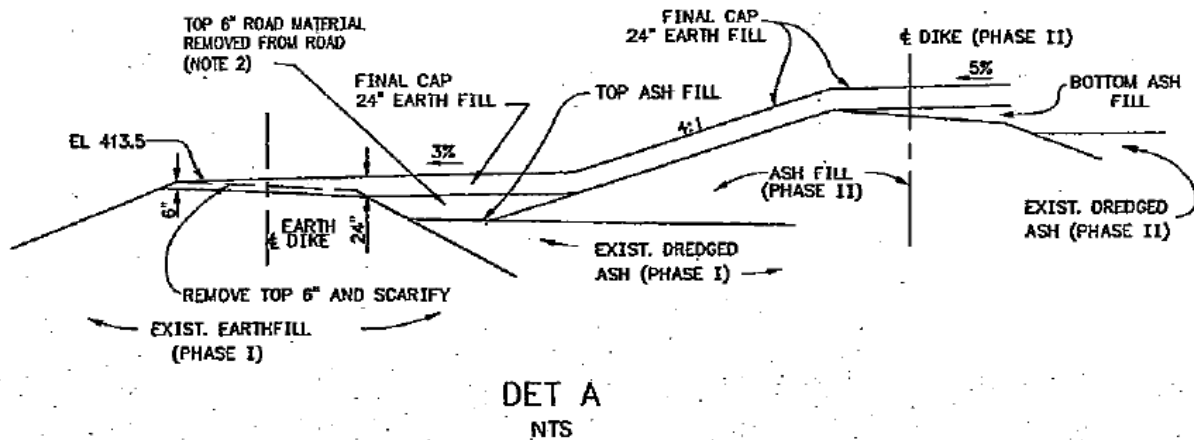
Design Closure Cross-Section from TVA Drawing 10W218-5 R2
